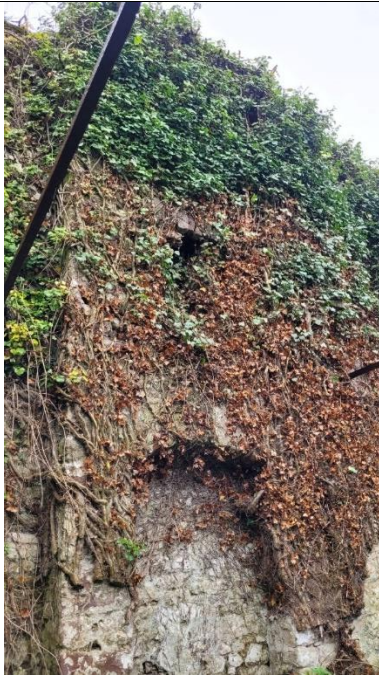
Ivy covered internal wall and stone steps to the rear of the building.
